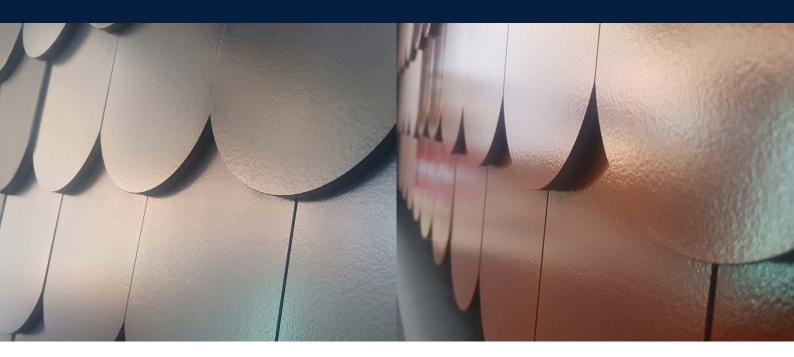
# PHOTONROOF ROOF TILES SYSTEMICALLY COMBINE WITH ANY TYPE OF ROOF COVERING
